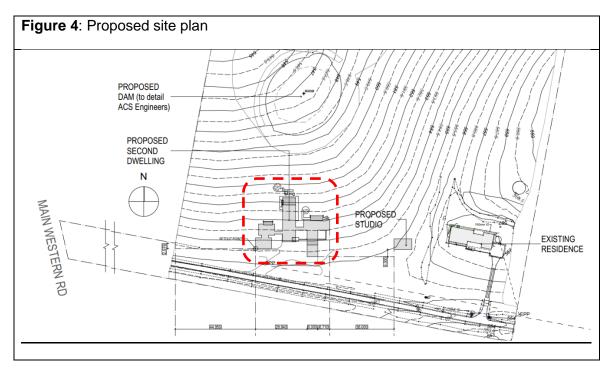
(below) provides an overview of the proposed site plan which shows the proposed second dwelling (highlighted in red).
